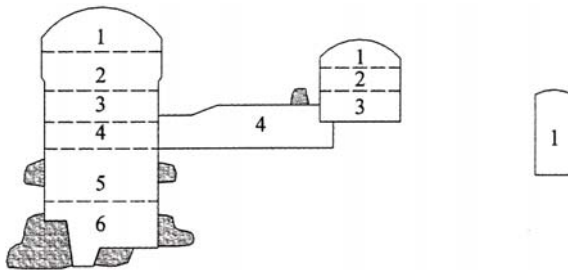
Distribution of surrounding rock rupture zone of typical section after sixth excavation
